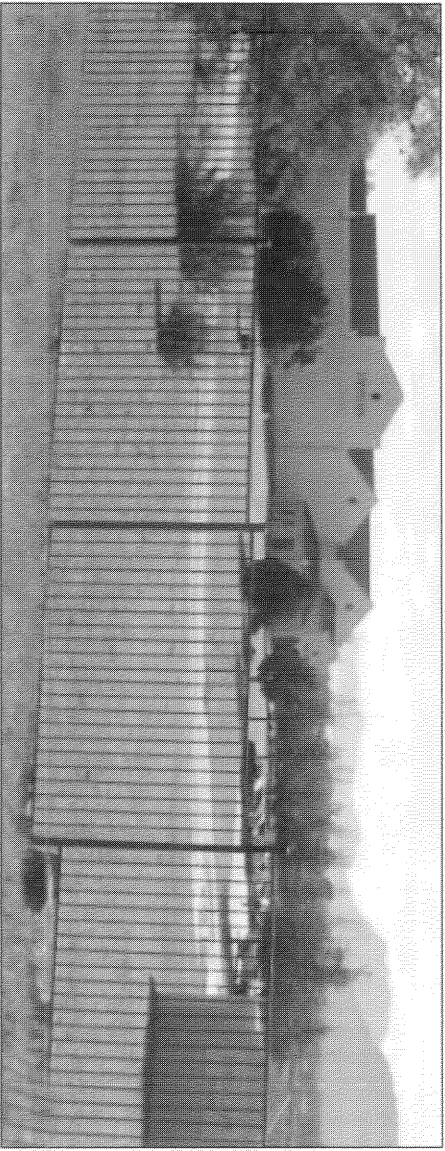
Existing winery, south elevation from entrance. Development area as indicated
